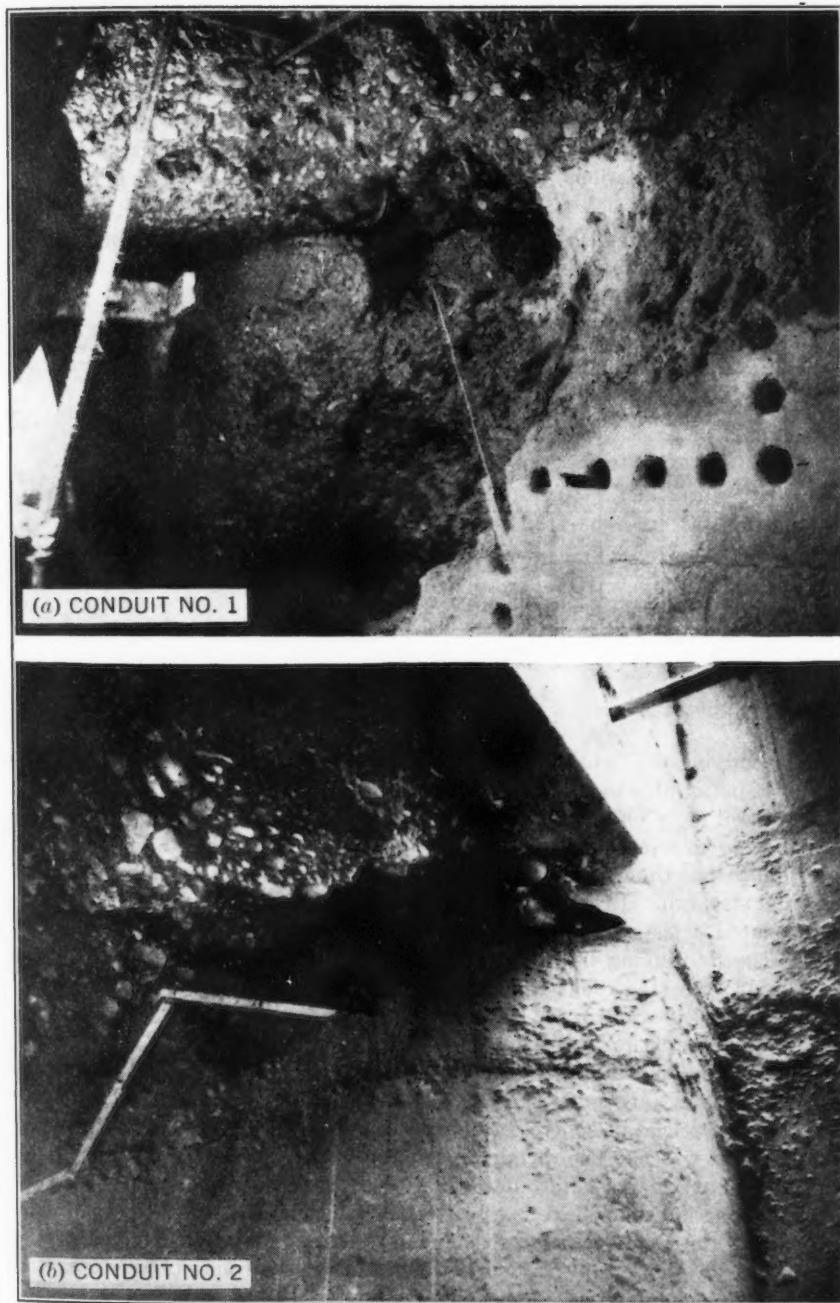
VIEWS FACING DOWNSTREAM TOWARD THE INTERSECTION OF THE TOP AND RIGHT SIDE-WALL OF CONDUITS, MADDEN DAM
